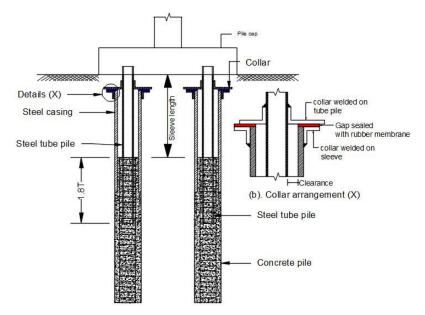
Proposed of arrangement of sleeved pile for bridge in the present study
